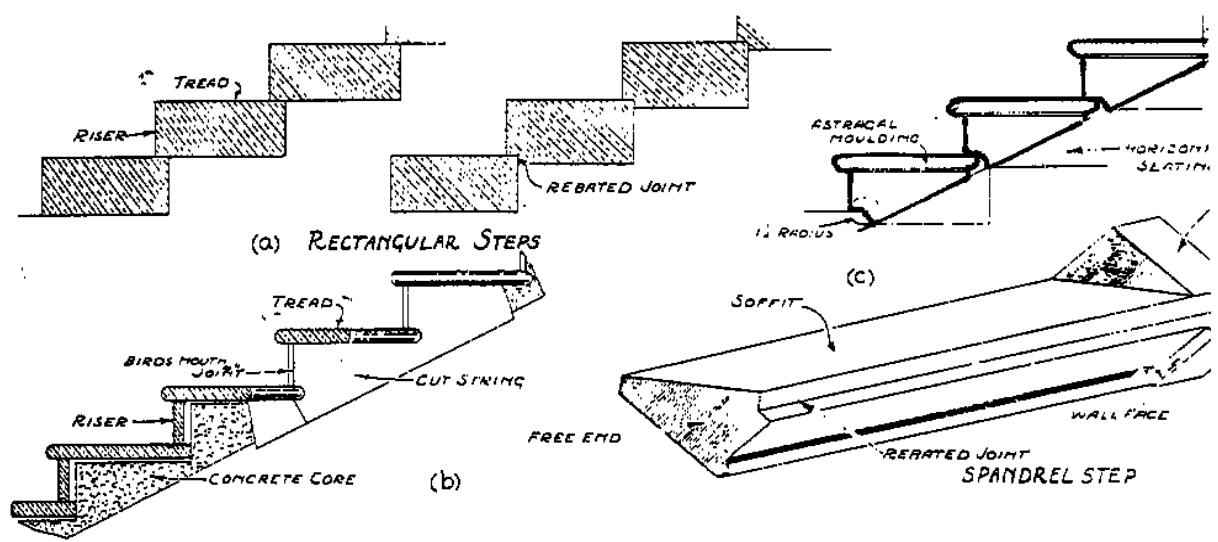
Details of a vernacular staircase (Warland, E. 1929)(4).
